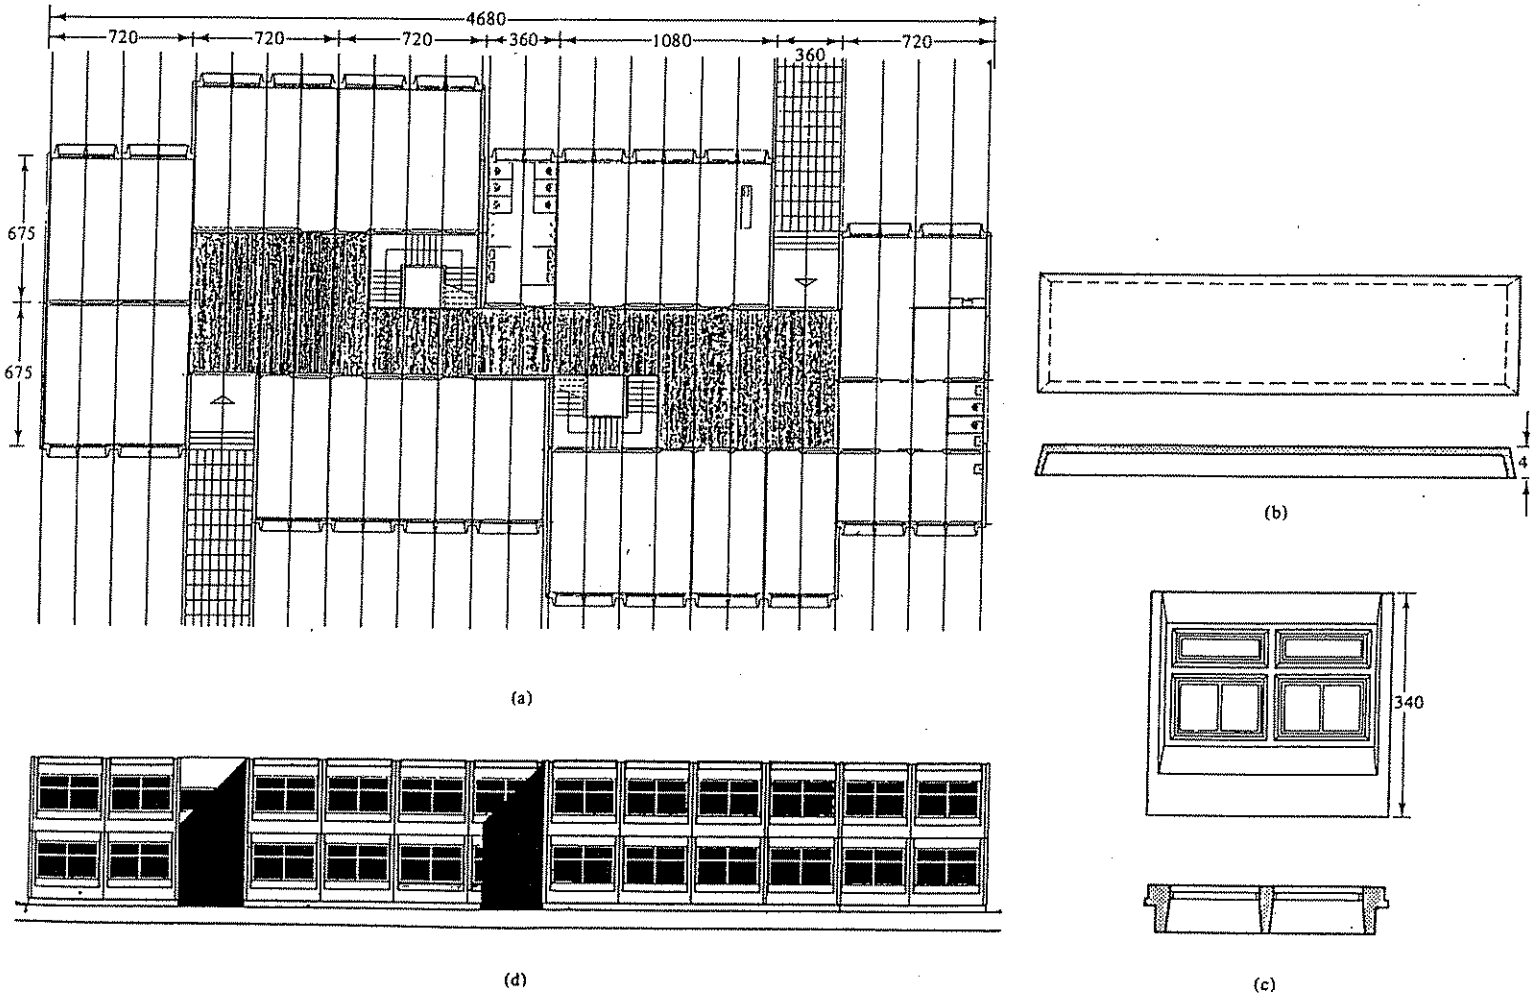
Yuval Gad school system (Israel): (a) general scheme, (b) cassette floor element, (c) diamond-shaped exterior wall, and (d) picture.
